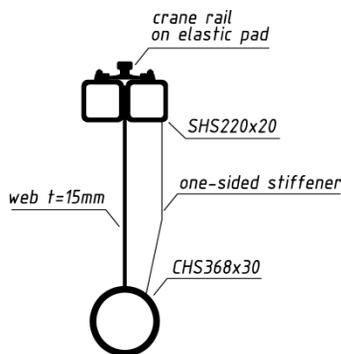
Innovative crane runway beam with thick-walled hollow section flanges without bracing of lower flange.
